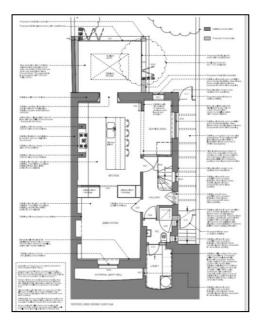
The proposed basement floor plan at no.10 Provost Road.
